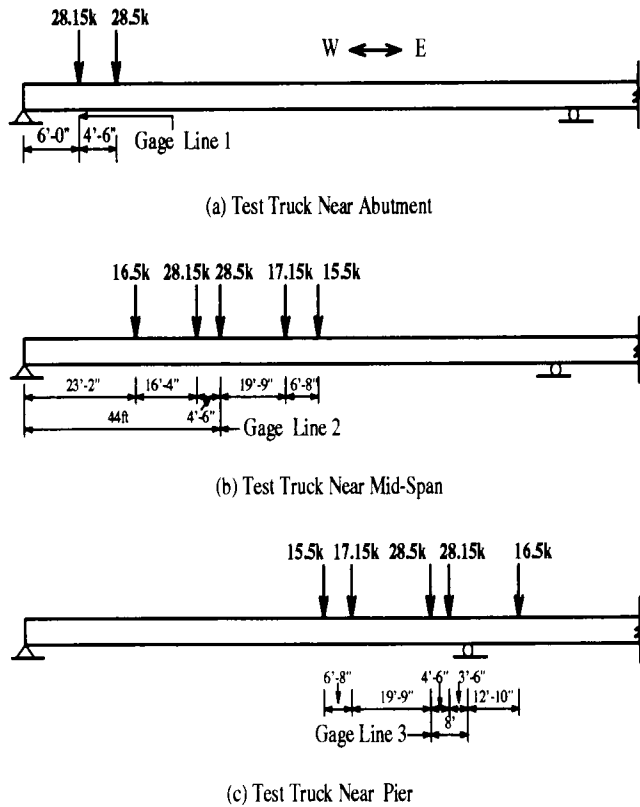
Longitudinal positions of test truck on the bridge (1 kip = 4.45 kN, 1 in. = 25.4 mm).
